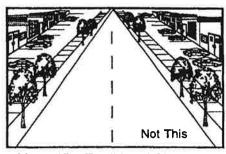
Exhibit B. Special Area Plan for the Traditional City Area Minimum Development Standards
